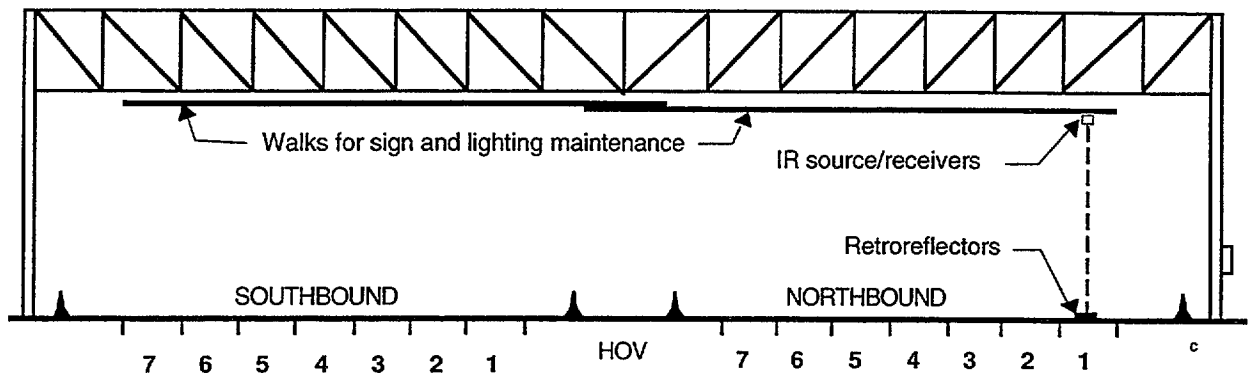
Sensor arrangement on 73 m-long sign bridge over fifteen traffic lanes.
